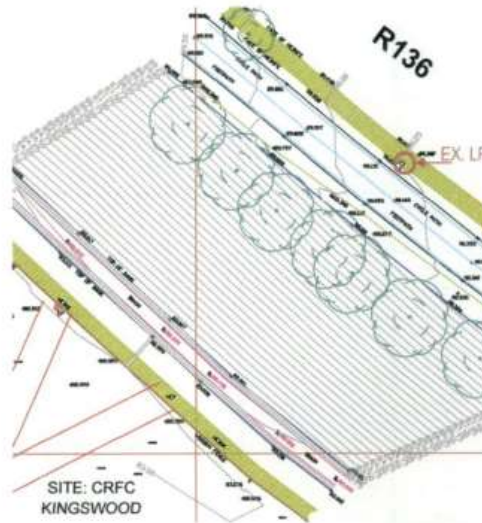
PROPOSED PEDESTRAIN STAIRS ACCESS OFF R136:
